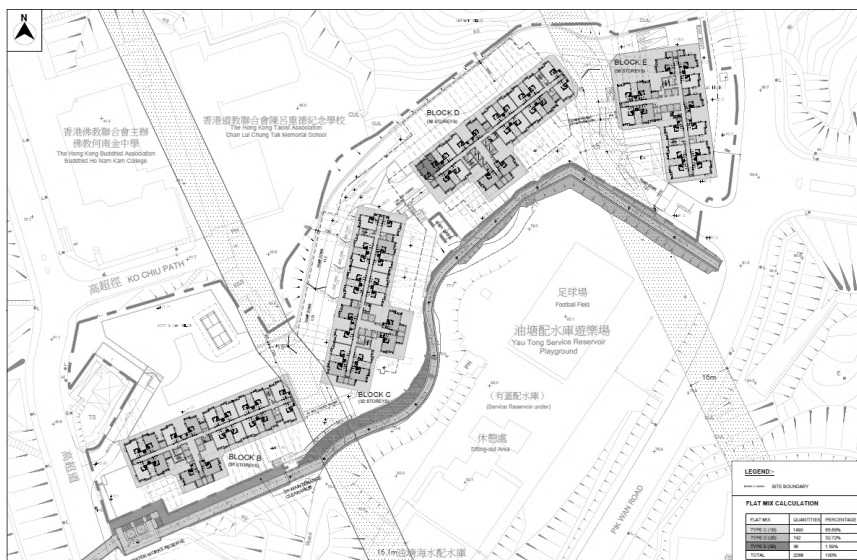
Plan of the Planned Development Pik Wan Road Site A
